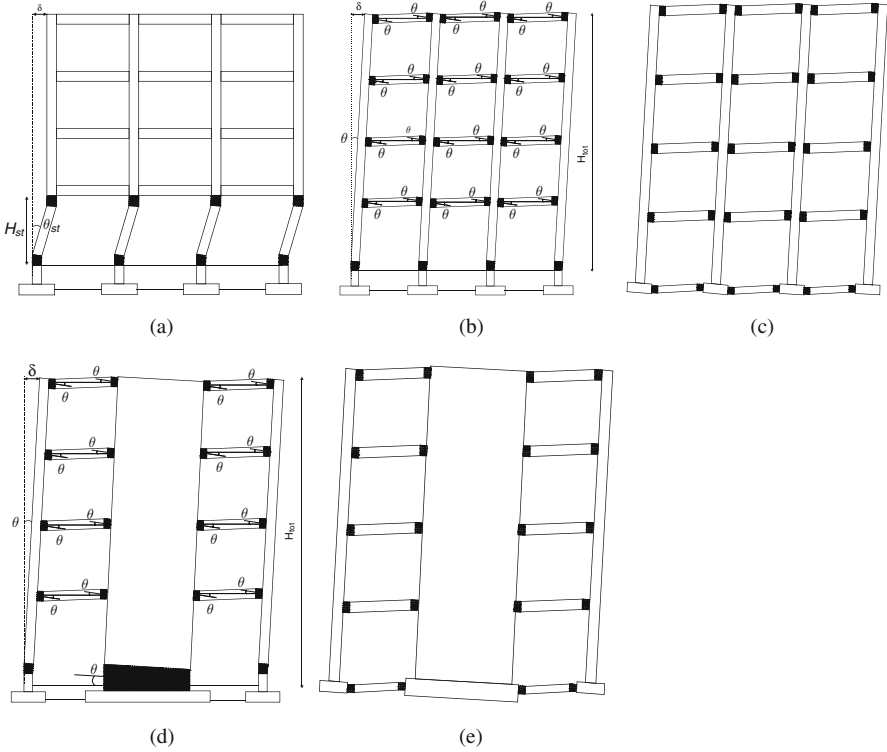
Plastic mechanisms in frame and wall systems: (a) soft-storey mechanism in weak column/strong beam frame; (b), (c) beam-sway mechanisms in strong column/weak beam frame; (d), (e) beam-sway mechanisms in wall system
